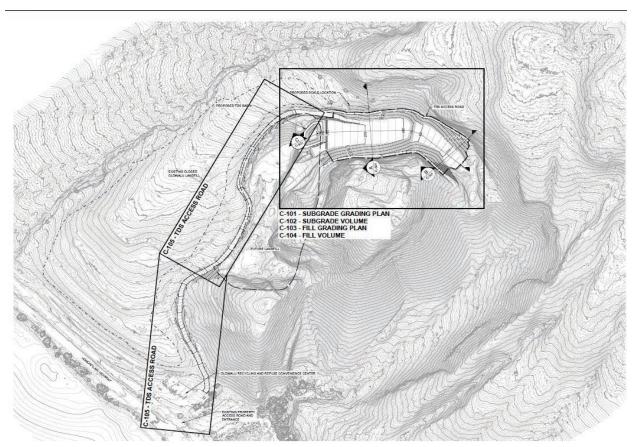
Plans Showing location of Site 1 TDSR and existing access road. APE corresponds to boundaries of the proposed TDSR and access road
